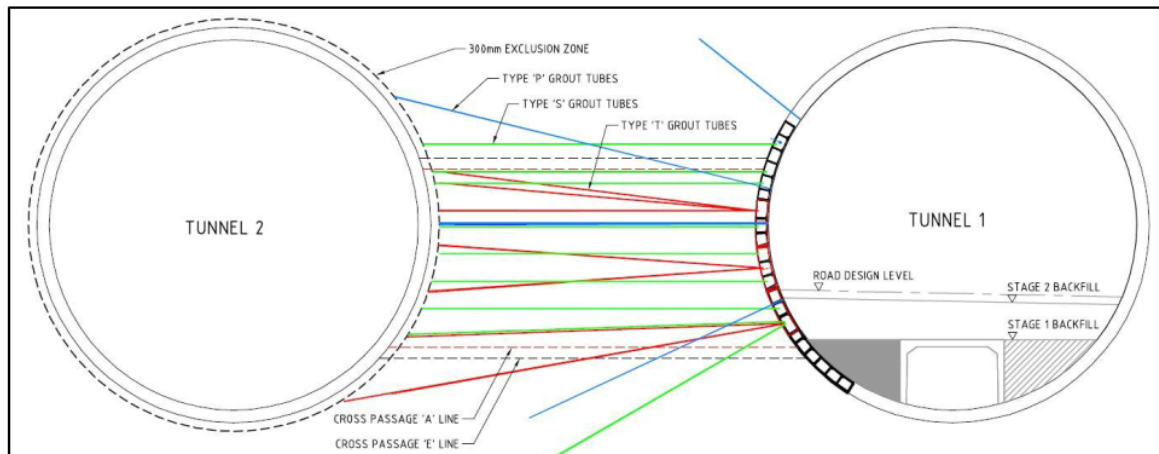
Typical Cross Passage Grout Holes Arrangement (Figure Extracted from the Waterview Connection Project Cross Passage Tunnels: Safety in Design and Construction (Okada, Giaque & Bhargava, 2017))
